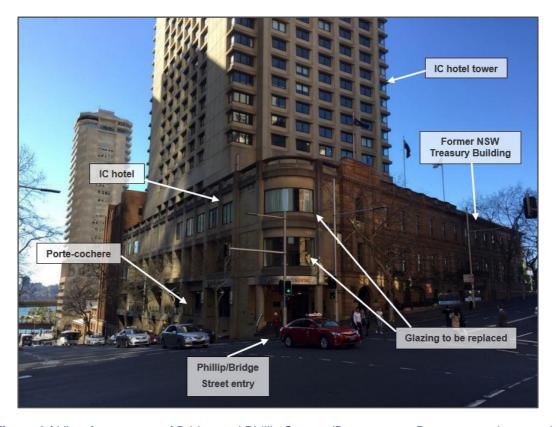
| View from corner of Bridge and Phillip Streets (Base source: Department photograph)
